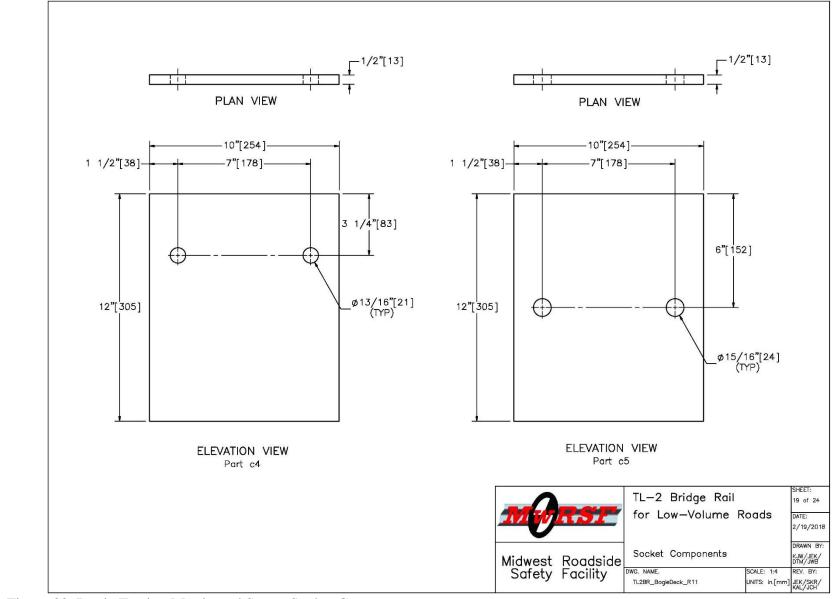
Bogie Testing Matrix and Setup, Socket Components
